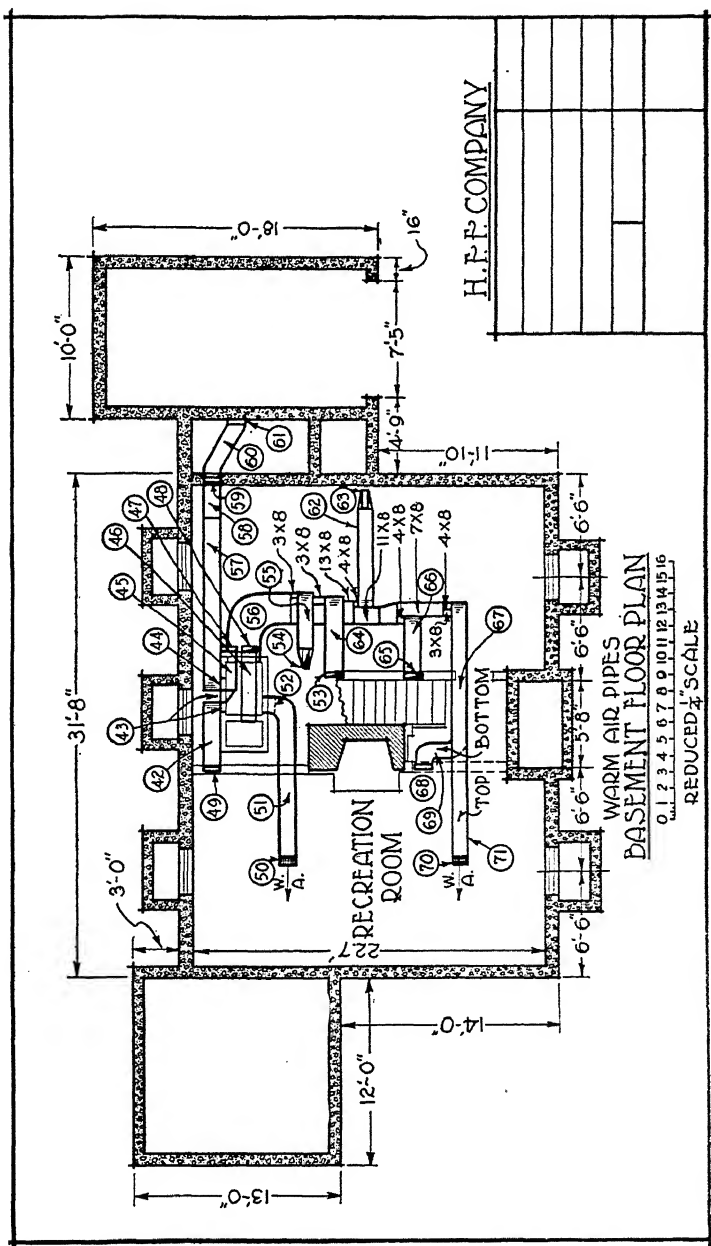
Basement Floor Plan Showing Warm-Air Ducts
